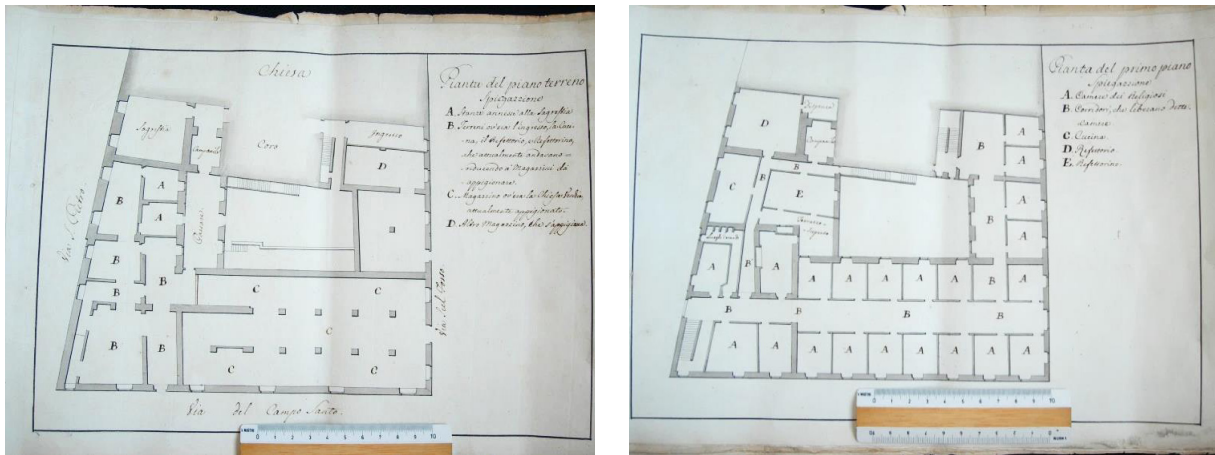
Livorno, the monastery, 1753-1759. Plans ground floor and first floor
